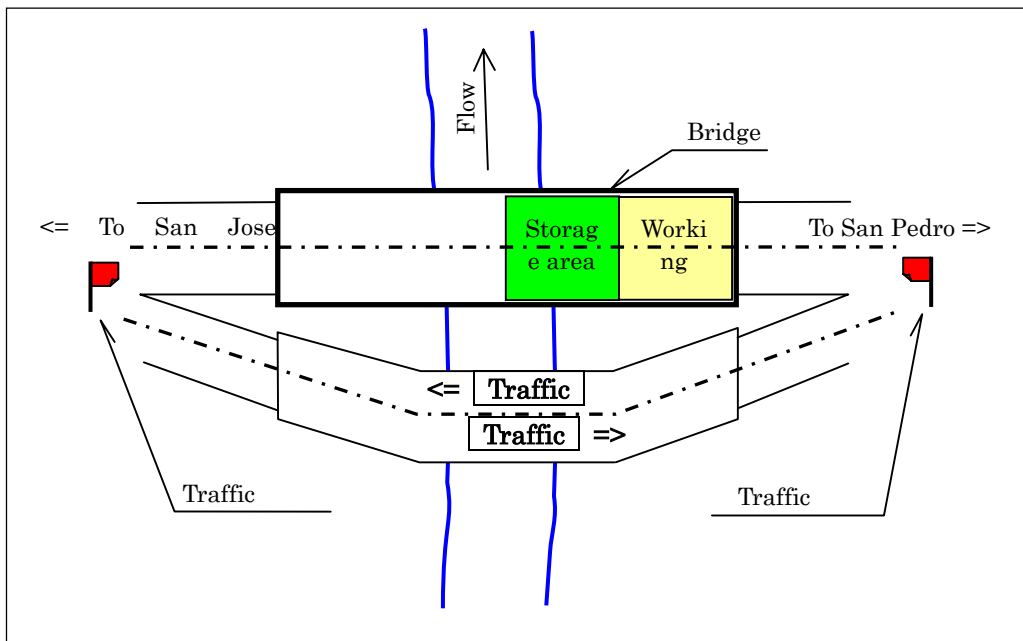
Model Layout of Storage Area on No. 29 Bridge (Rio Torres)
